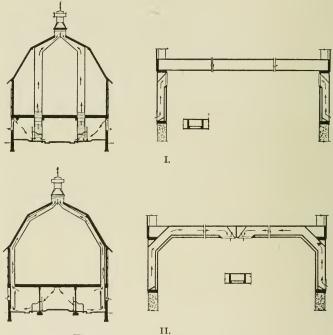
King system of ventilation. I. Arranged for cows facing outward. II. Arranged for cows facing center aisle.
